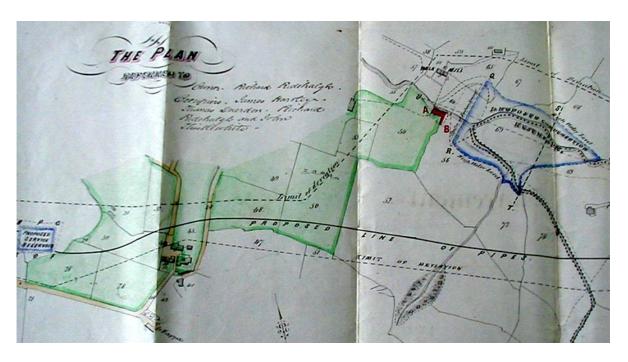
Plan for the Walverden Compensation Reservoir, 1866
